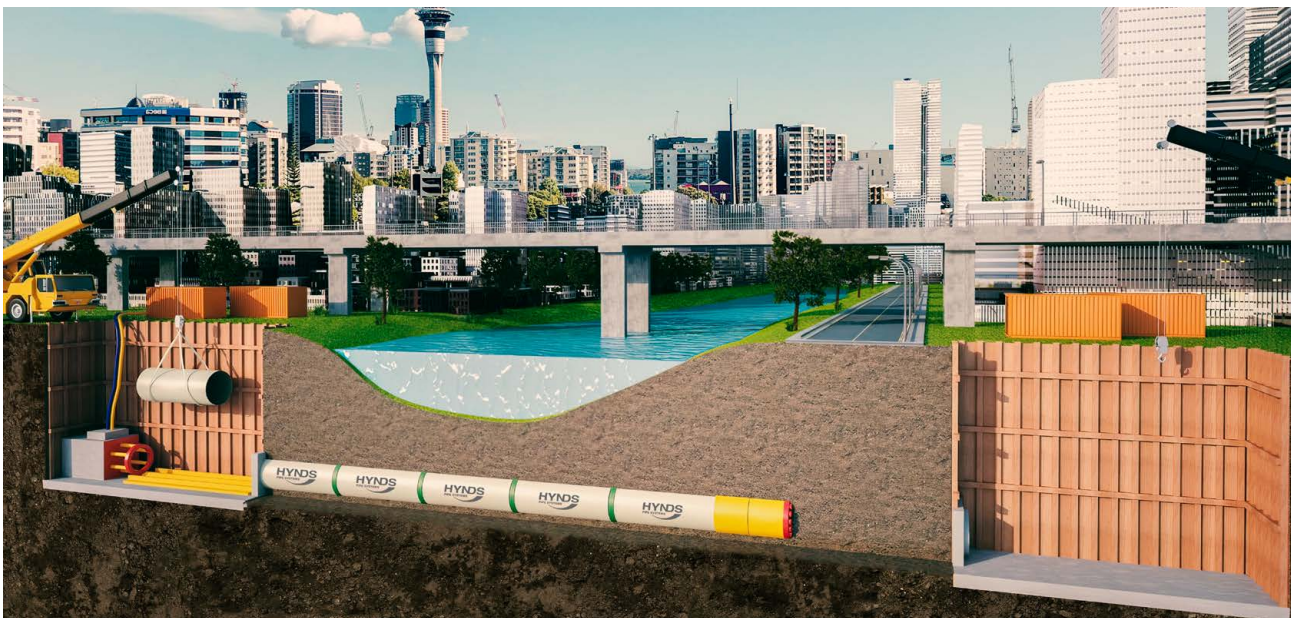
Typical installation of GRP pipes using Micro Tunnelling (with TBM), via launch and retrieval shafts.
